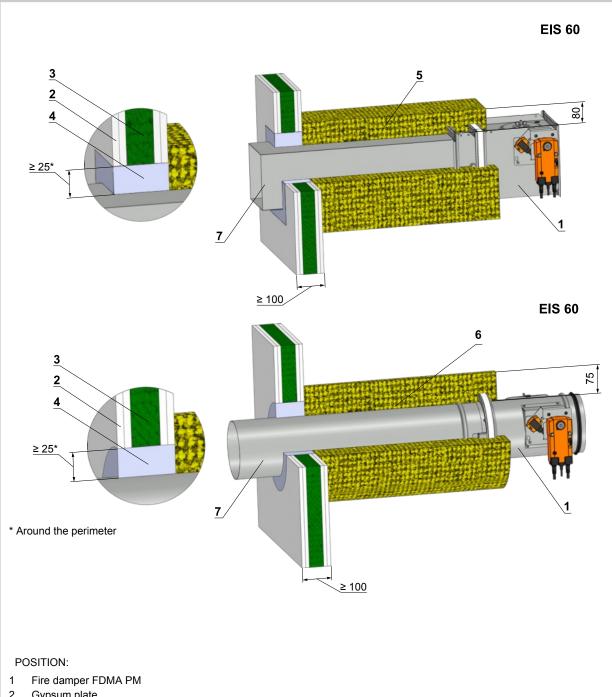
Installation outside of gypsum wall construction - mineral wool - mortar or gypsum
